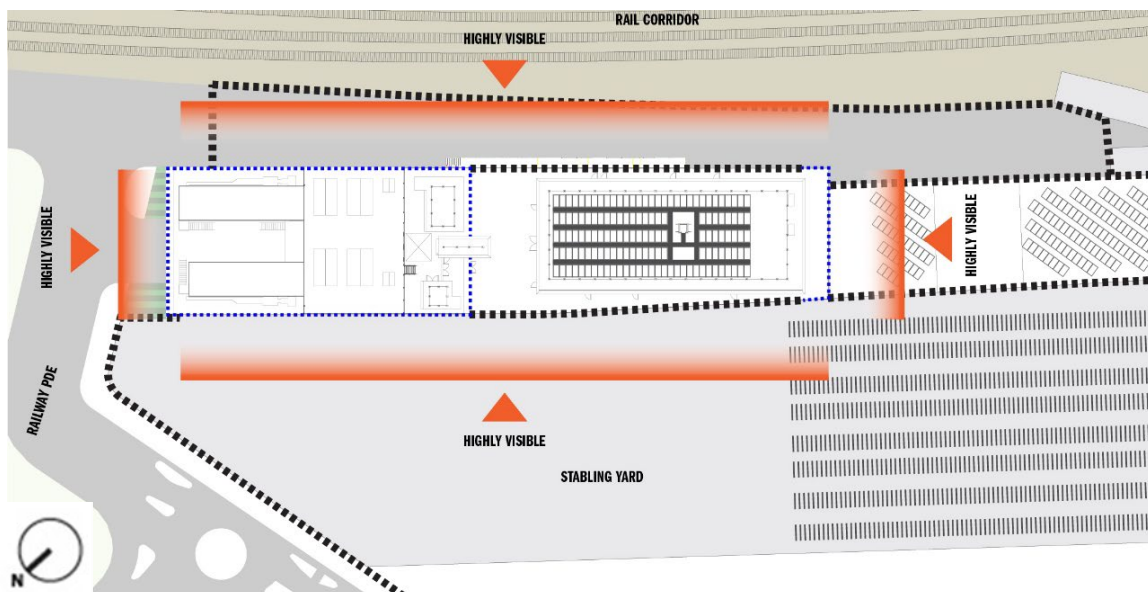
Marrickville Dive site - Building visibility from public areas
